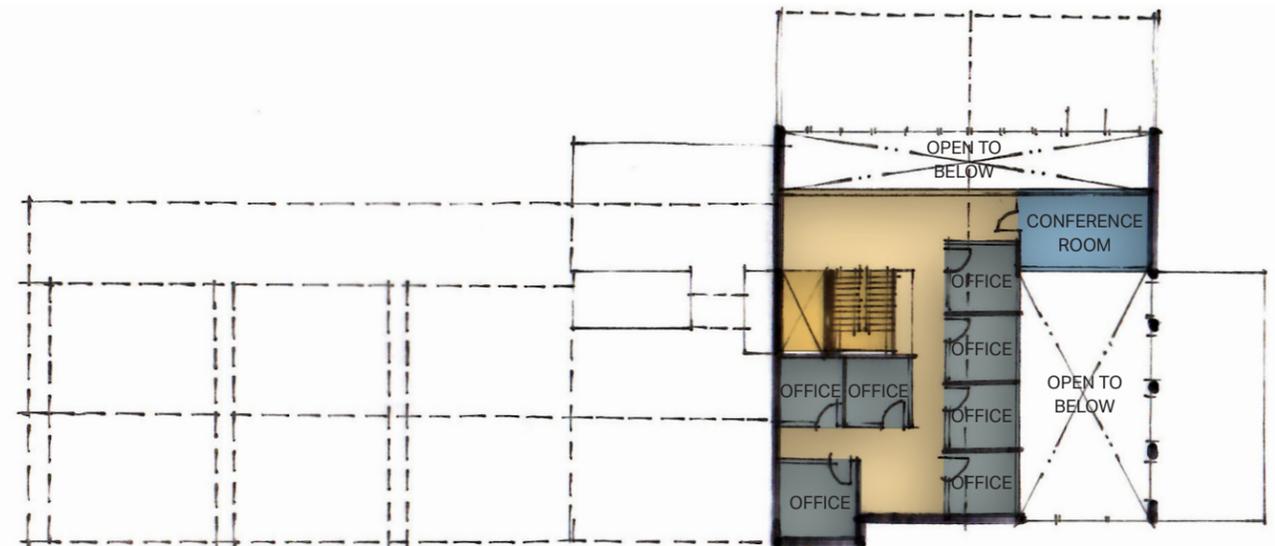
PROPOSED BOATHOUSE OPTION 3 - FIRST FLOOR
